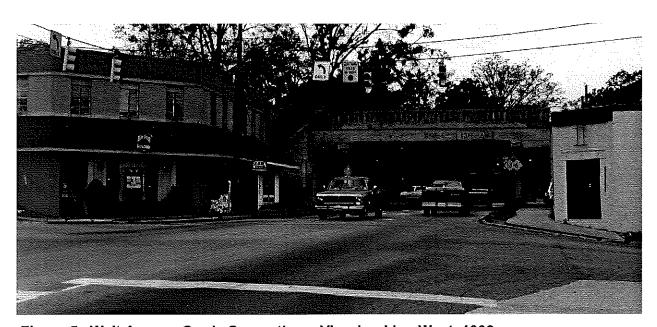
Wait Avenue Grade Separation – View Looking West, 1998.
